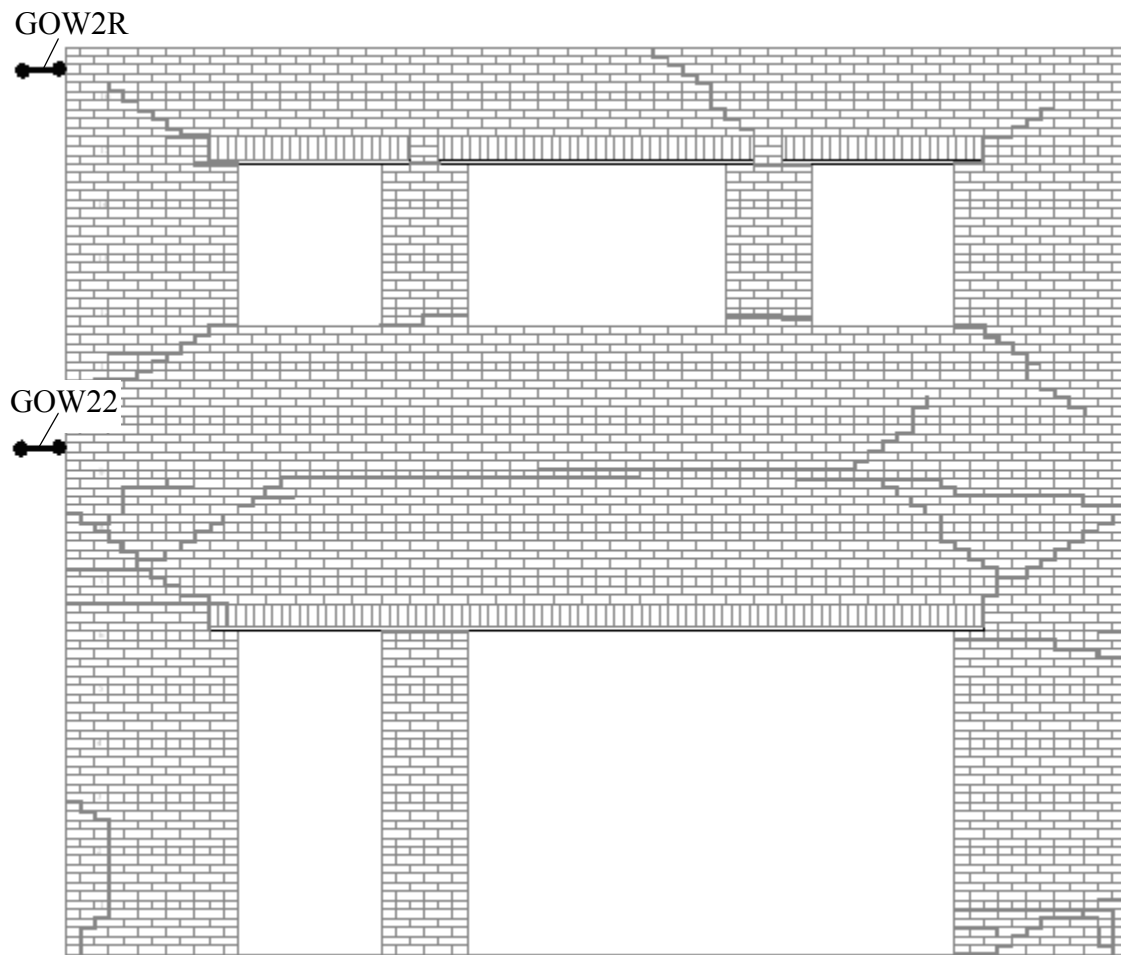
Elevation view of Wall 2 illustrating the location of LVDTs
